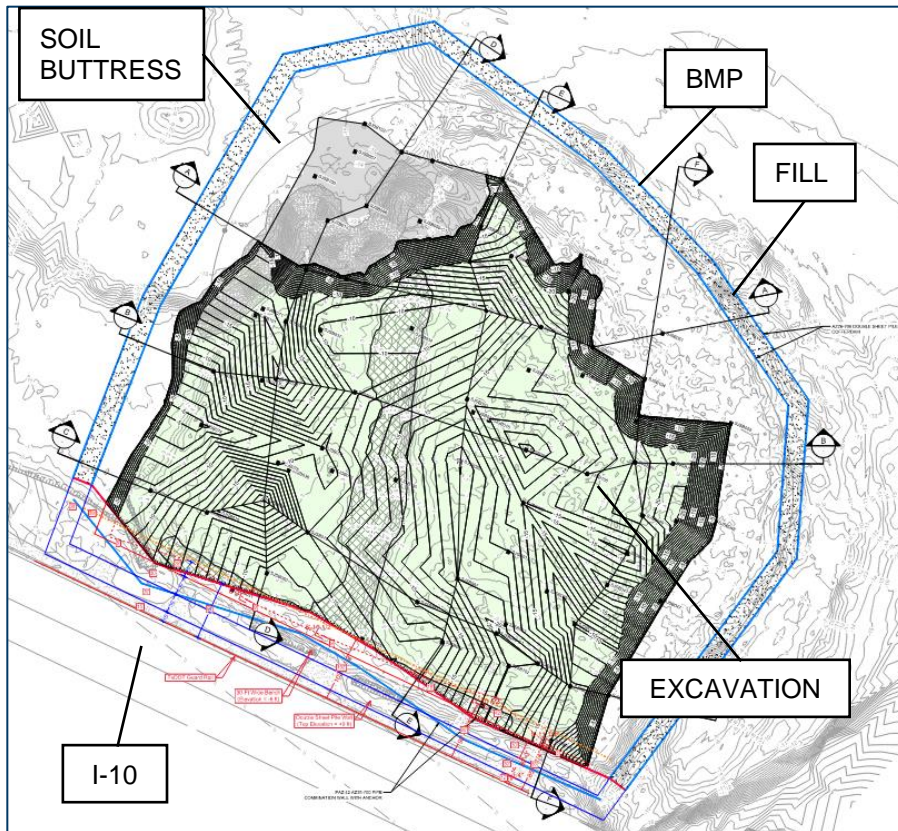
Northern Impoundment BMP Alignment - Plan View
